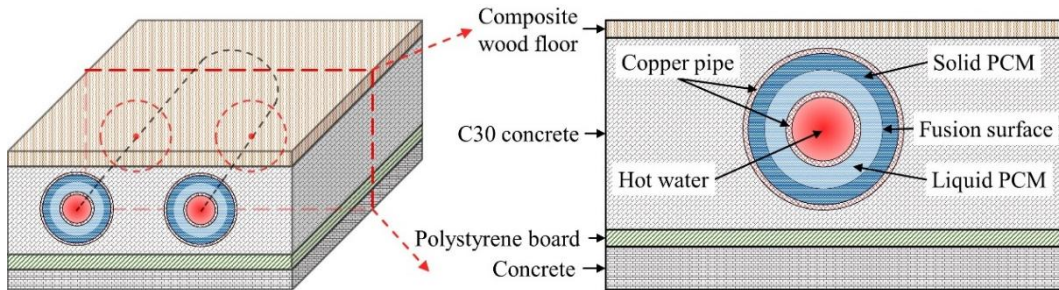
Structure and cross-section view of the build-in PCM heat storage unit.
